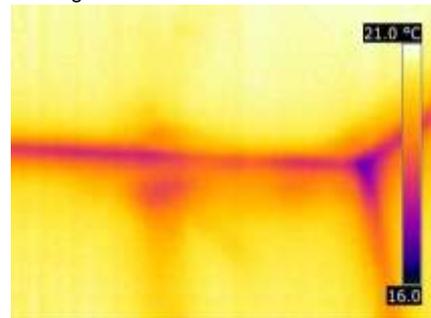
IR image internal wall and ceiling junction of plot 20 showing heat loss through junction detailing
